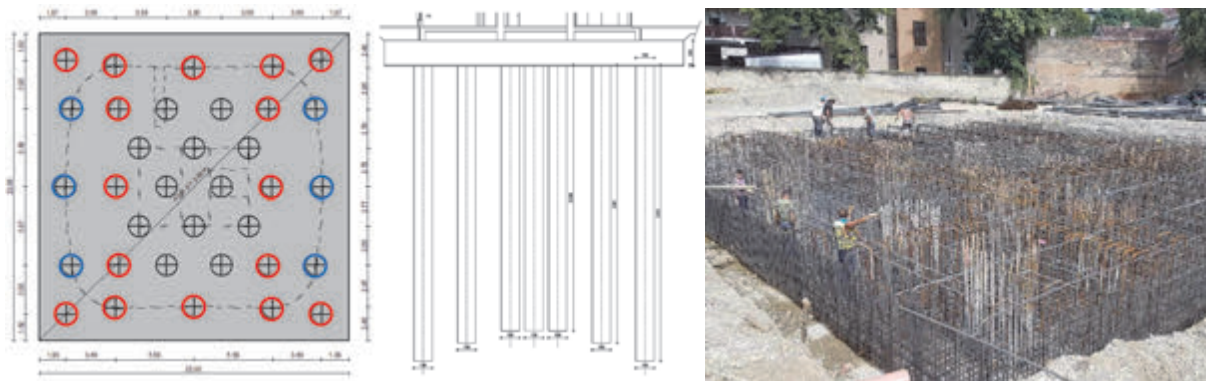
Foundation slab with piles and the reinforcement in the foundation slab and piles
